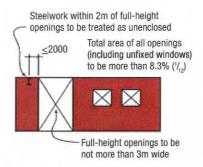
Maximum extent of openings in masonry walls for steelwork to be deemed to be 'enclosed'
